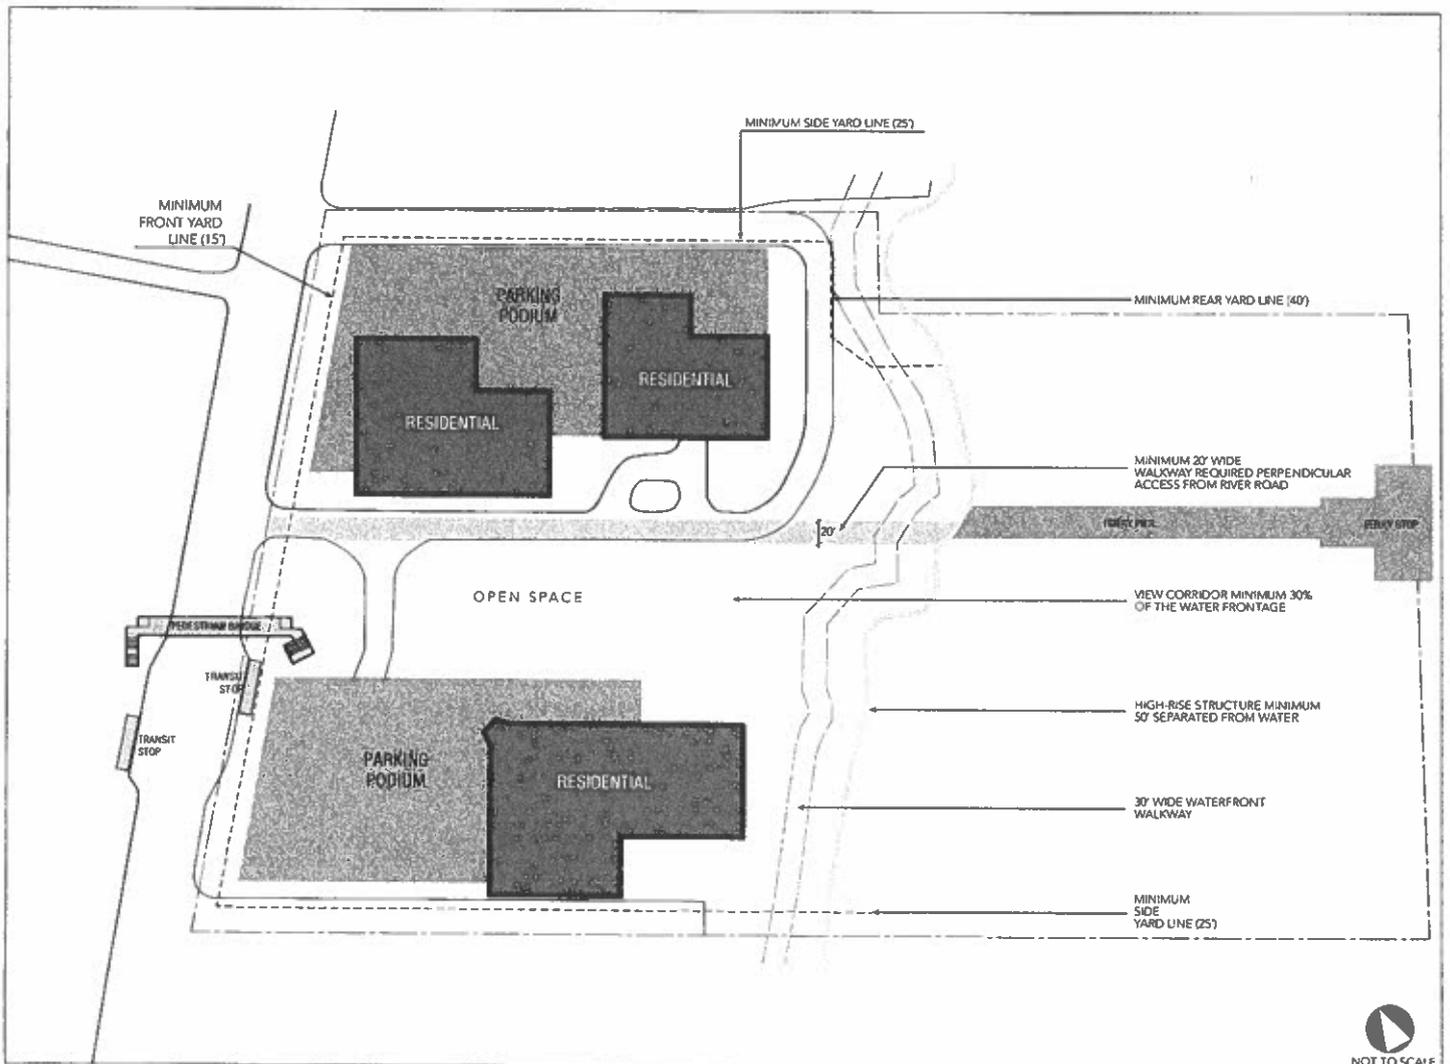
Concept Plan | 615 River Road Redevelopment Plan | Borough of Edgewater, New Jersey
